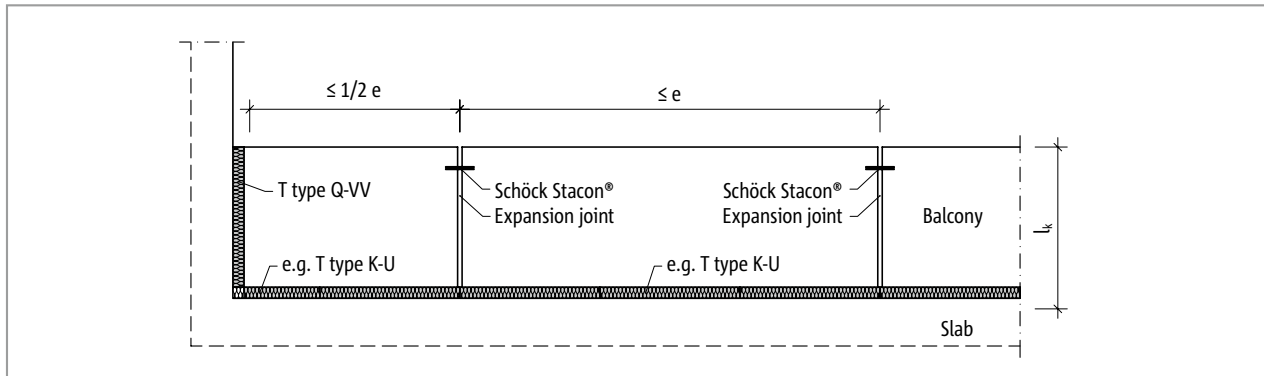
Schöck Isokorb® T type K-U: Expansion joint layout
